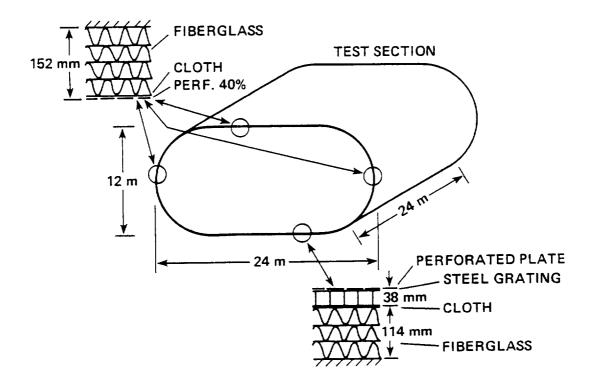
Existing 40 × 80 test section acoustic wall lining.
